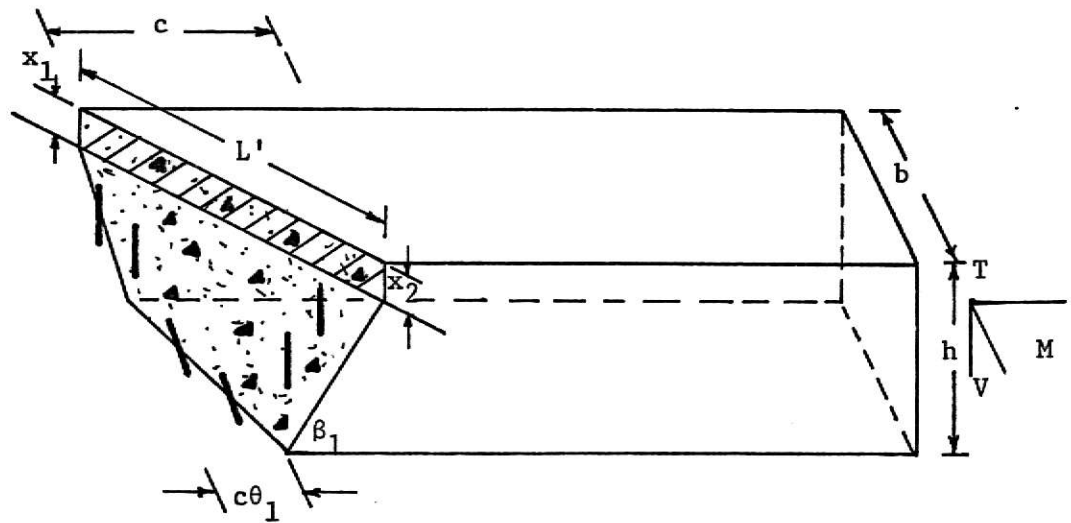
Section of a Reinforced Concrete Beam at First Mode of Failure.
